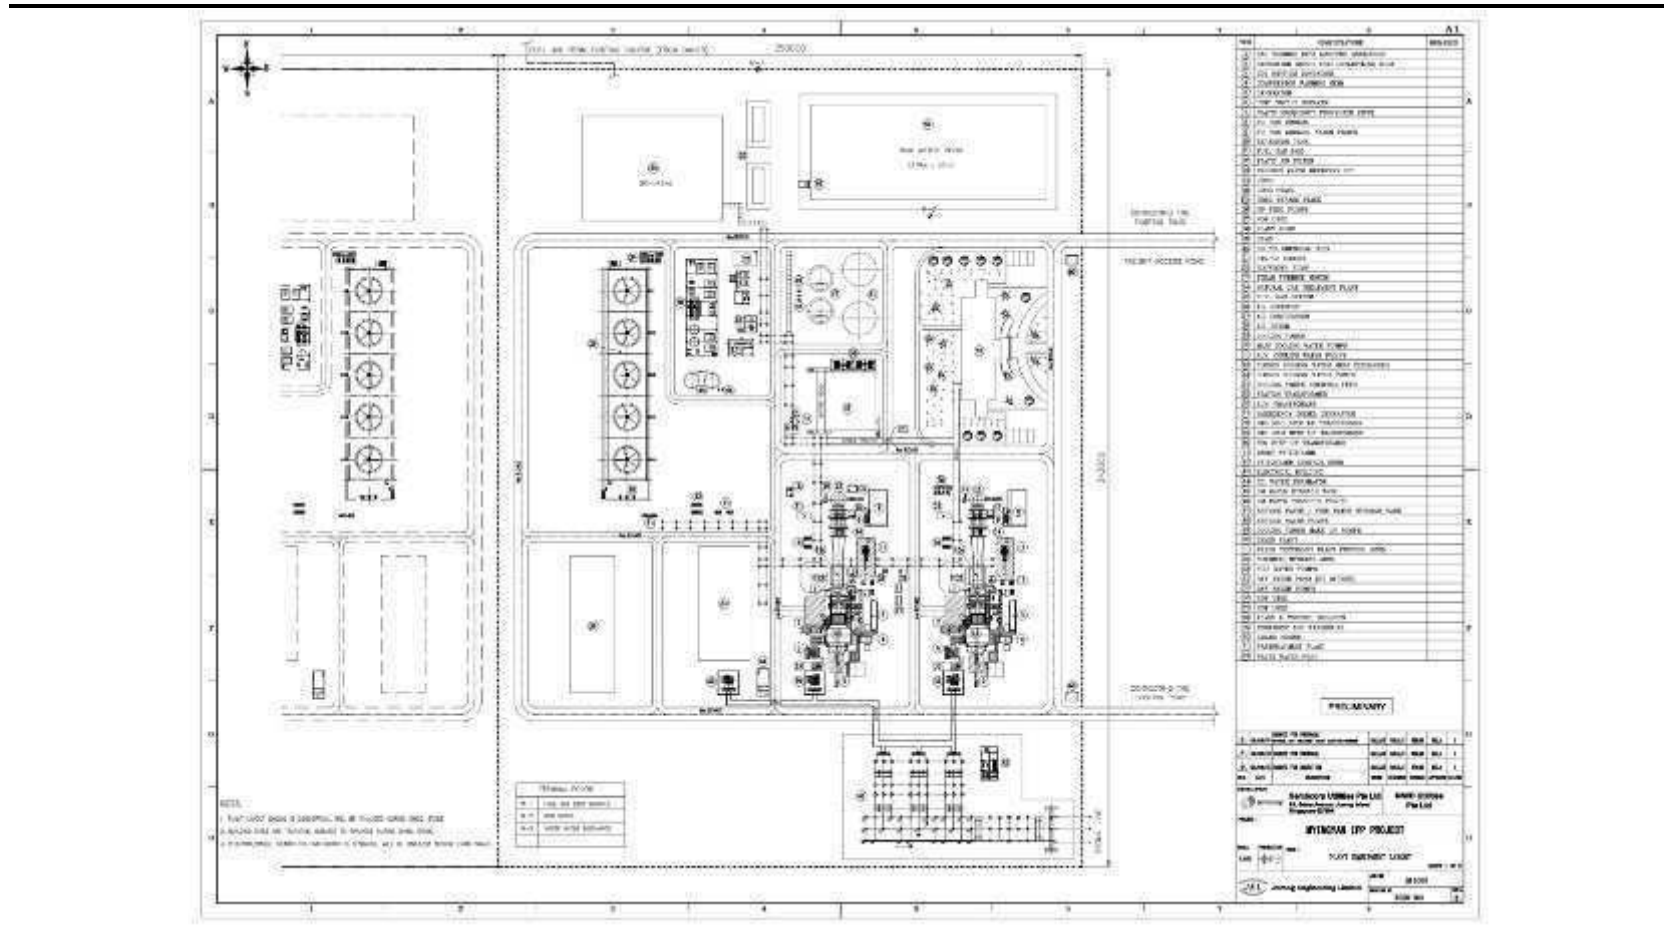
CCGT Power Plant Layout of Project Facilities [9]
